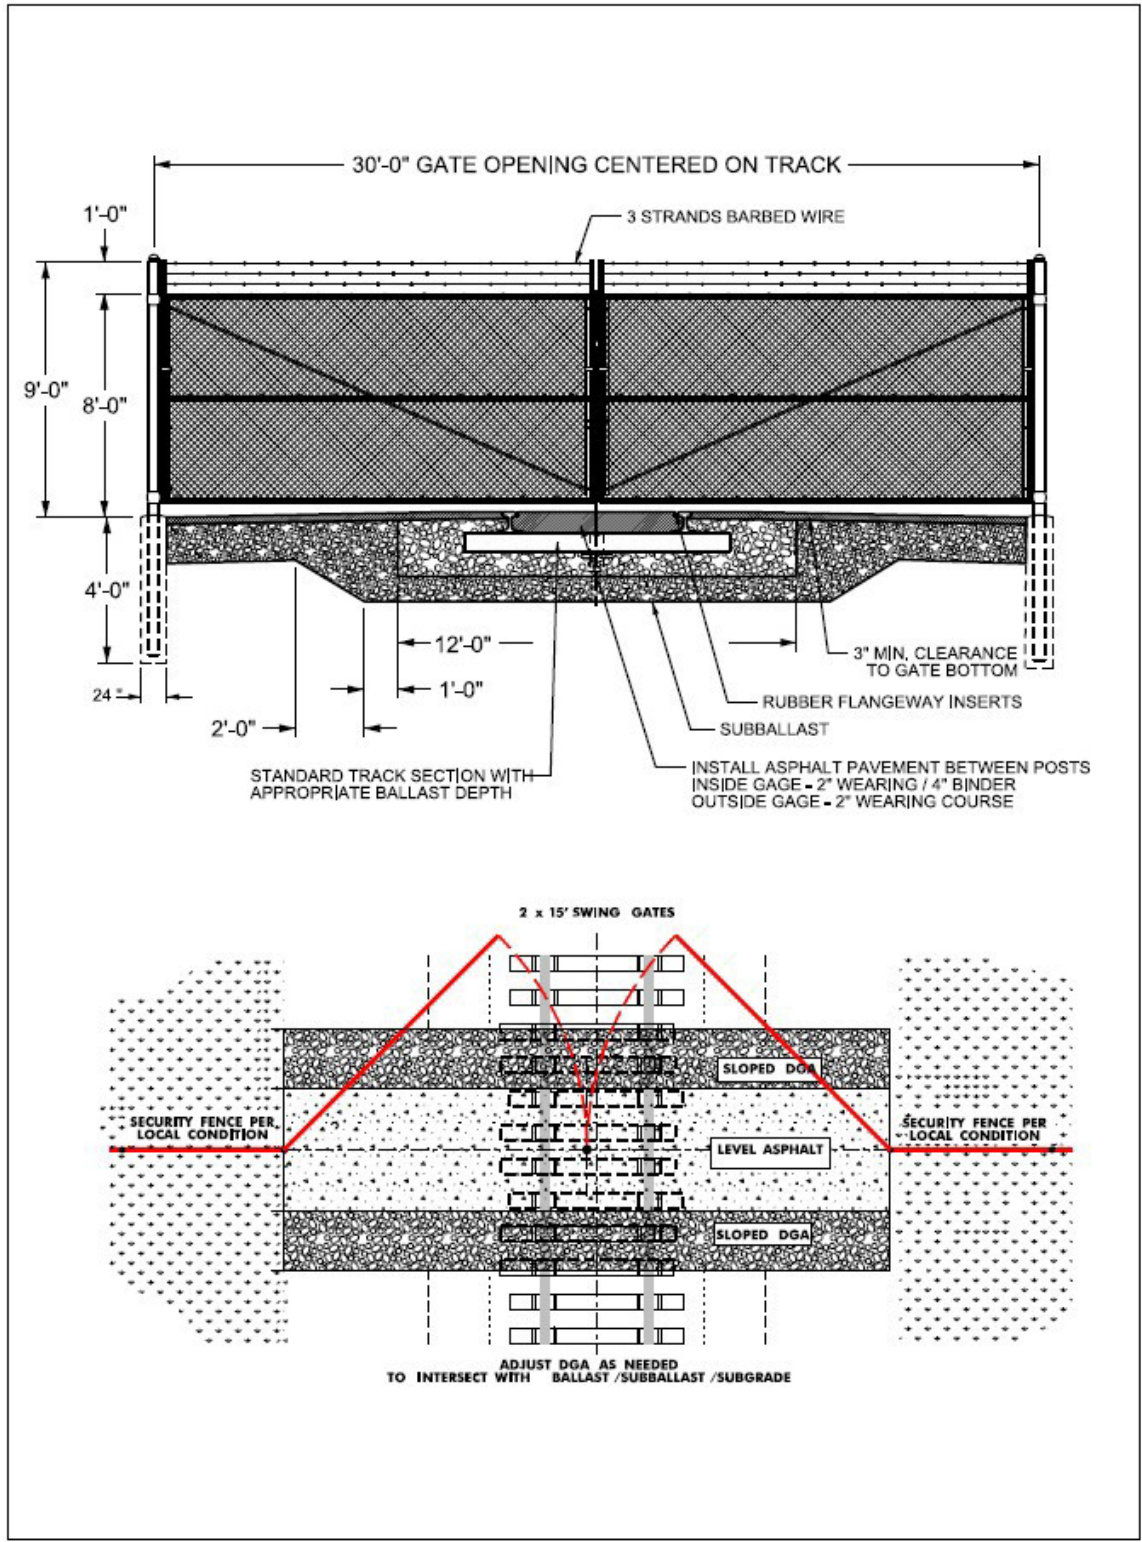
Representative design plan for a security type Line Gate in a cross-track application that conforms to the Roadbed Section.
